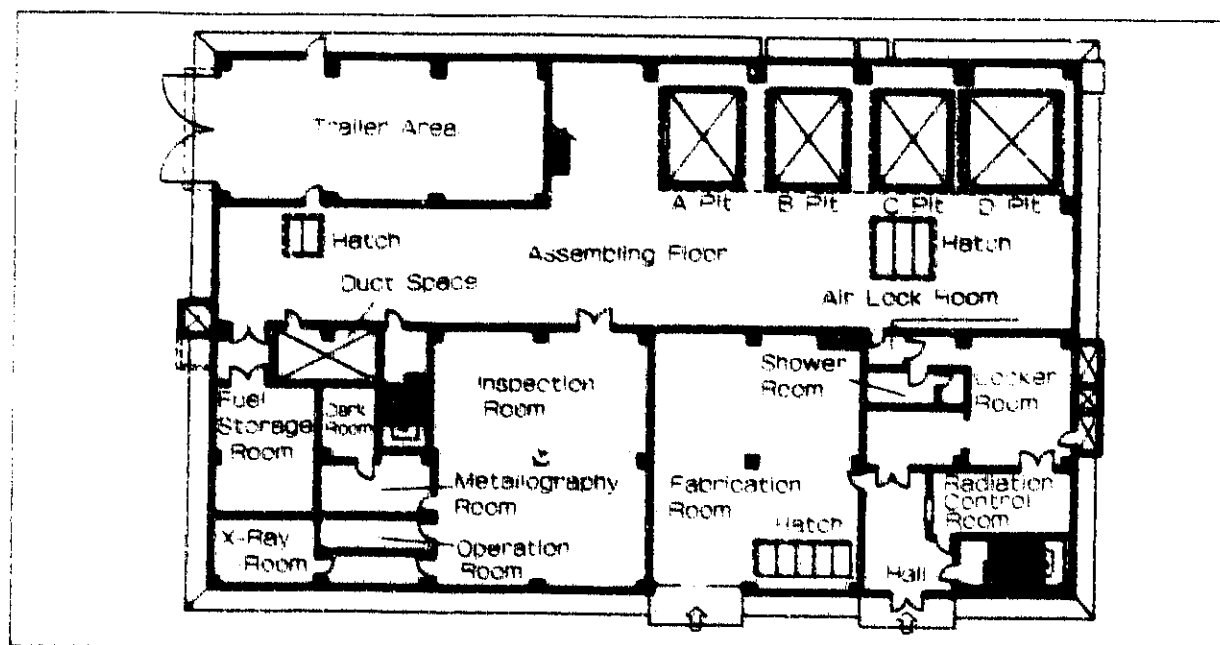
Irradiation Rig Assembling Facility : 1st Floor Plan
